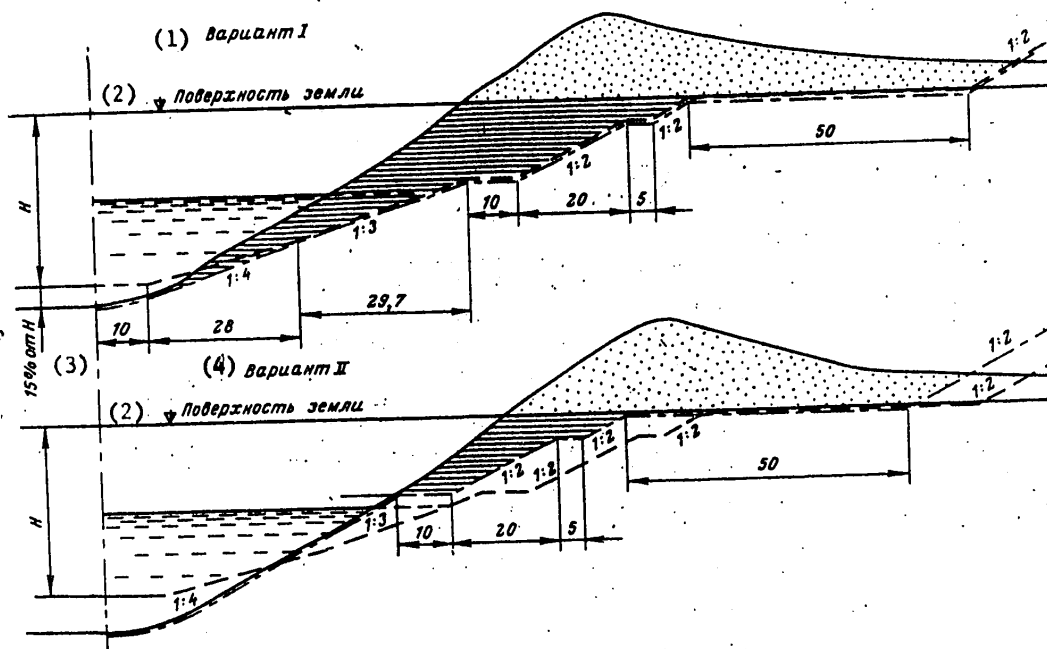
Variants of planned cross sections for canal with use being made of blasting method of construction
